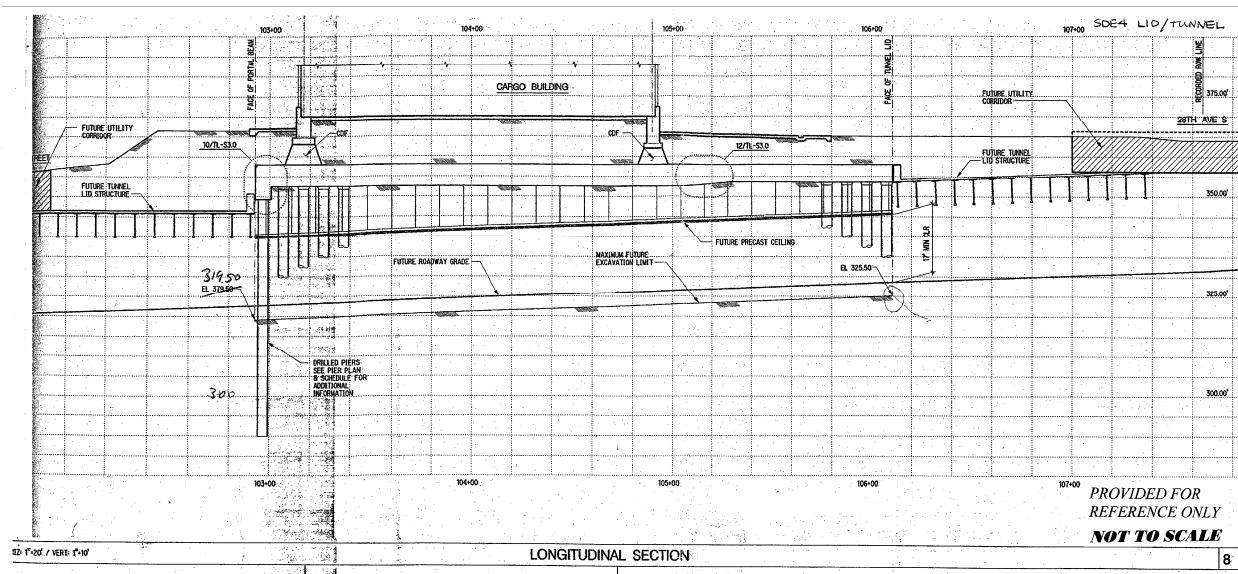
Northwest Airlines Cargo Building with Future Tunnel Lid Structure
